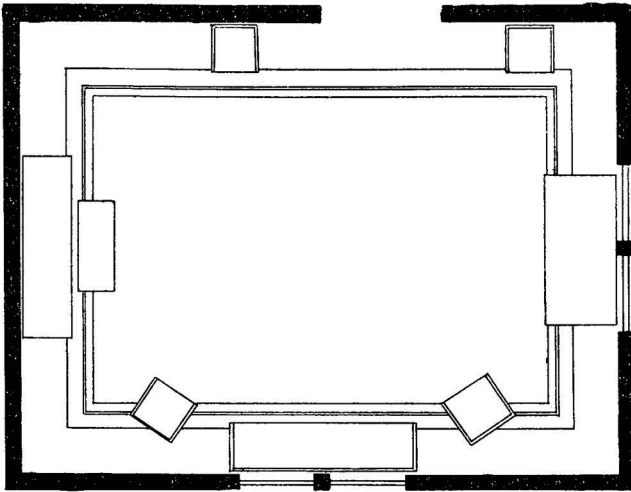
Plan of room showing a good, symmetrical arrangement of furniture. The large pieces are placed parallel with the wall and are well distributed.
